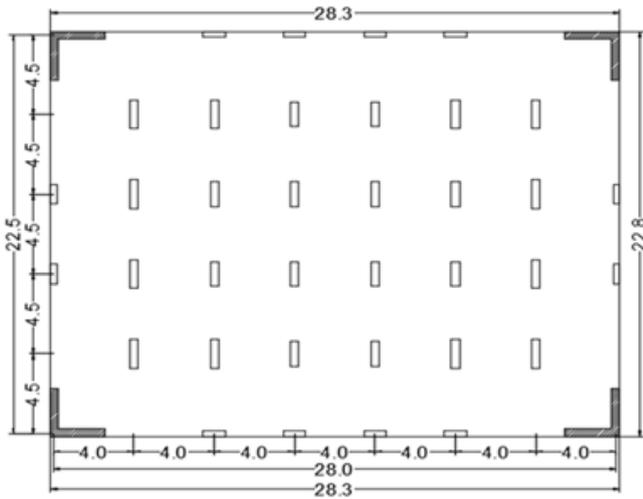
Model (2) Building with (L-shape) shear walls at Corners
